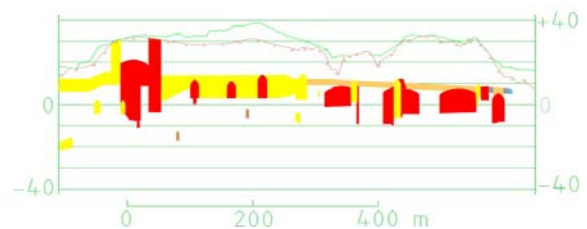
Longitudinal Section of the Viikinkmäki Waste Water Treatment Plant
